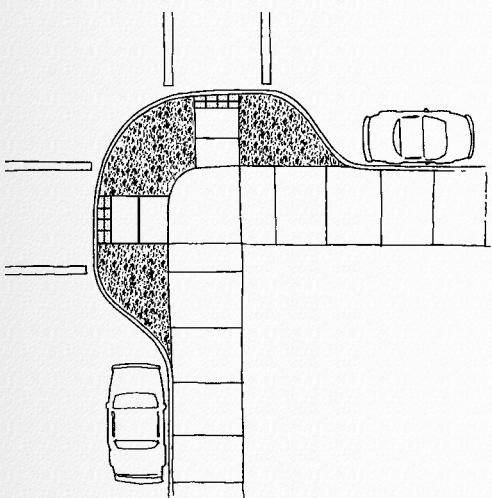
Curb extensions extend corners into parking lanes and provide space for curb ramps.
